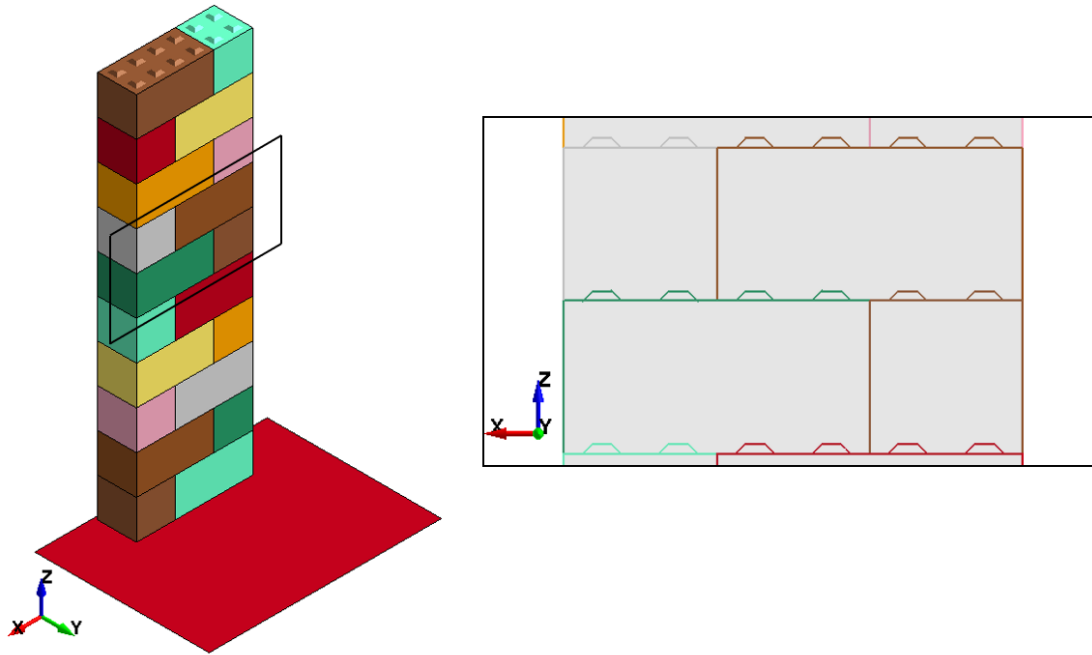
Model brick wall (left) and close up view of the wall stacking (right)
